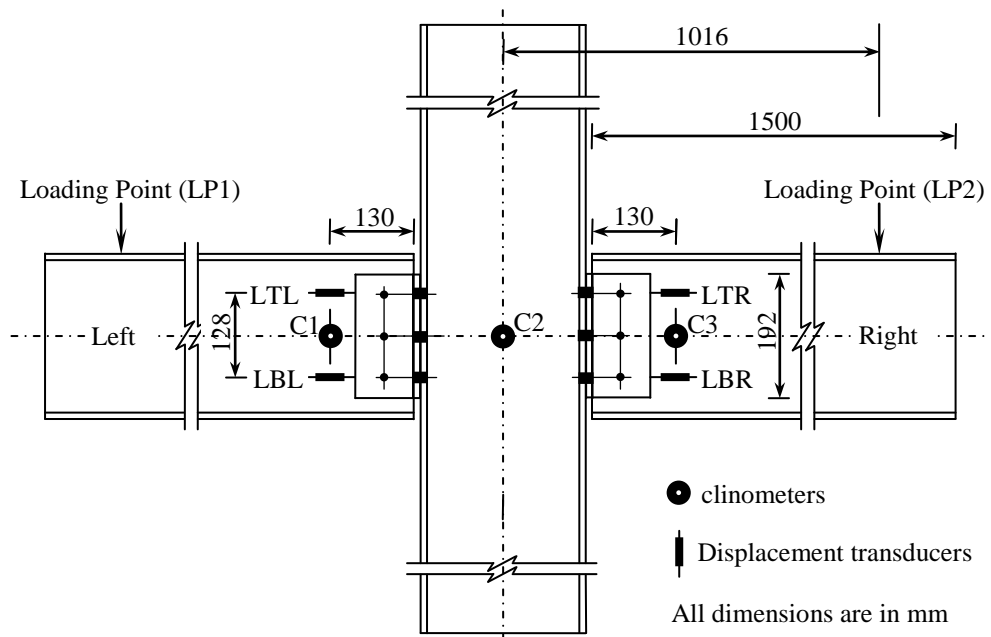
Location of instrumentation for the steel web cleated beam-to-column joint tests.
